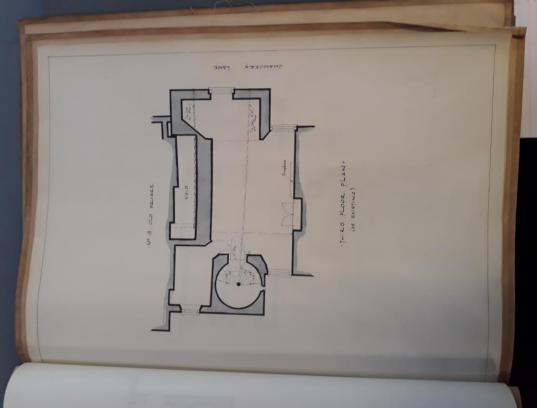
Third and fourth floor plan of North Tower prior to reconstruction. Note the void and spiral staircase, which contribute towards the dinstinctly different layout to the current condition of Flat 1, No.27 Old Buildings.
